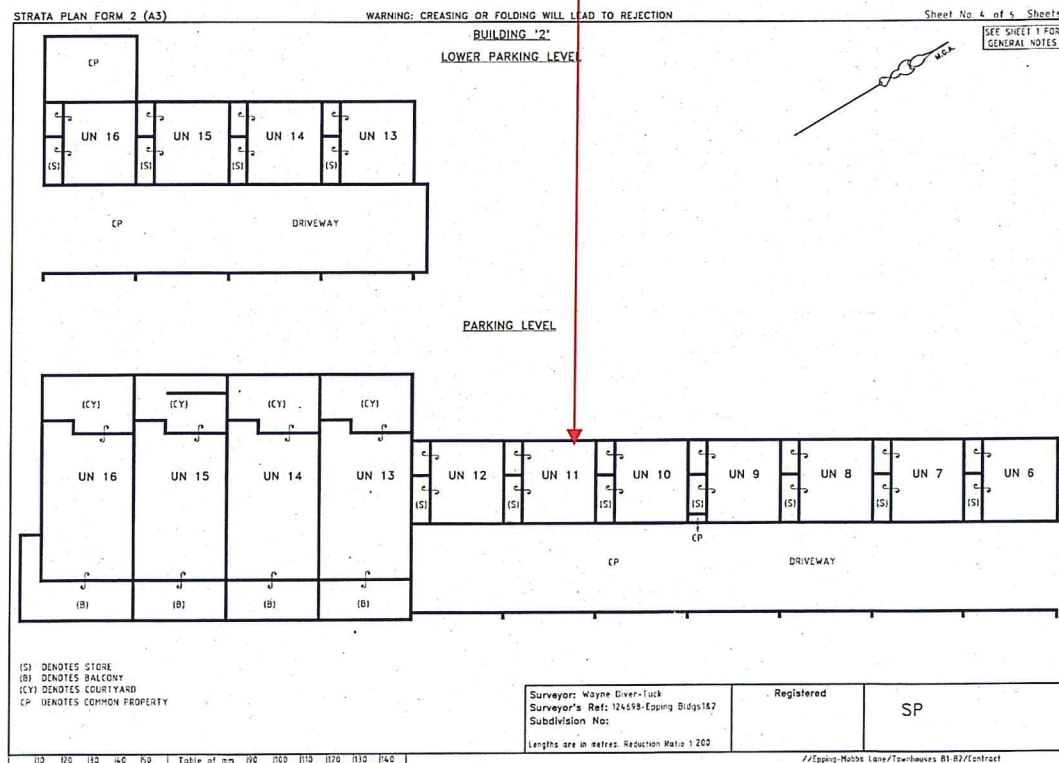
Building '2' Lower Parking Level and Parking Level proposed strata subdivision plan.
